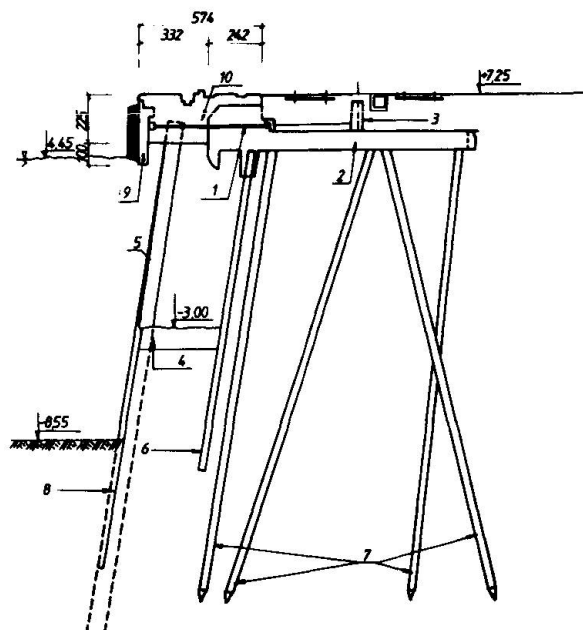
Cross-section of the strengthened berthing structure [4]: 1-prestressed anchor, 2-existing cover plate, 3-new crane-rail beam, 4-concrete, 5-H-piles, 6-existing BZ-sheet piling, 7-existing concrete piles, 8-Z-sheets, 9-prefabricated element, 10-new head beam.
